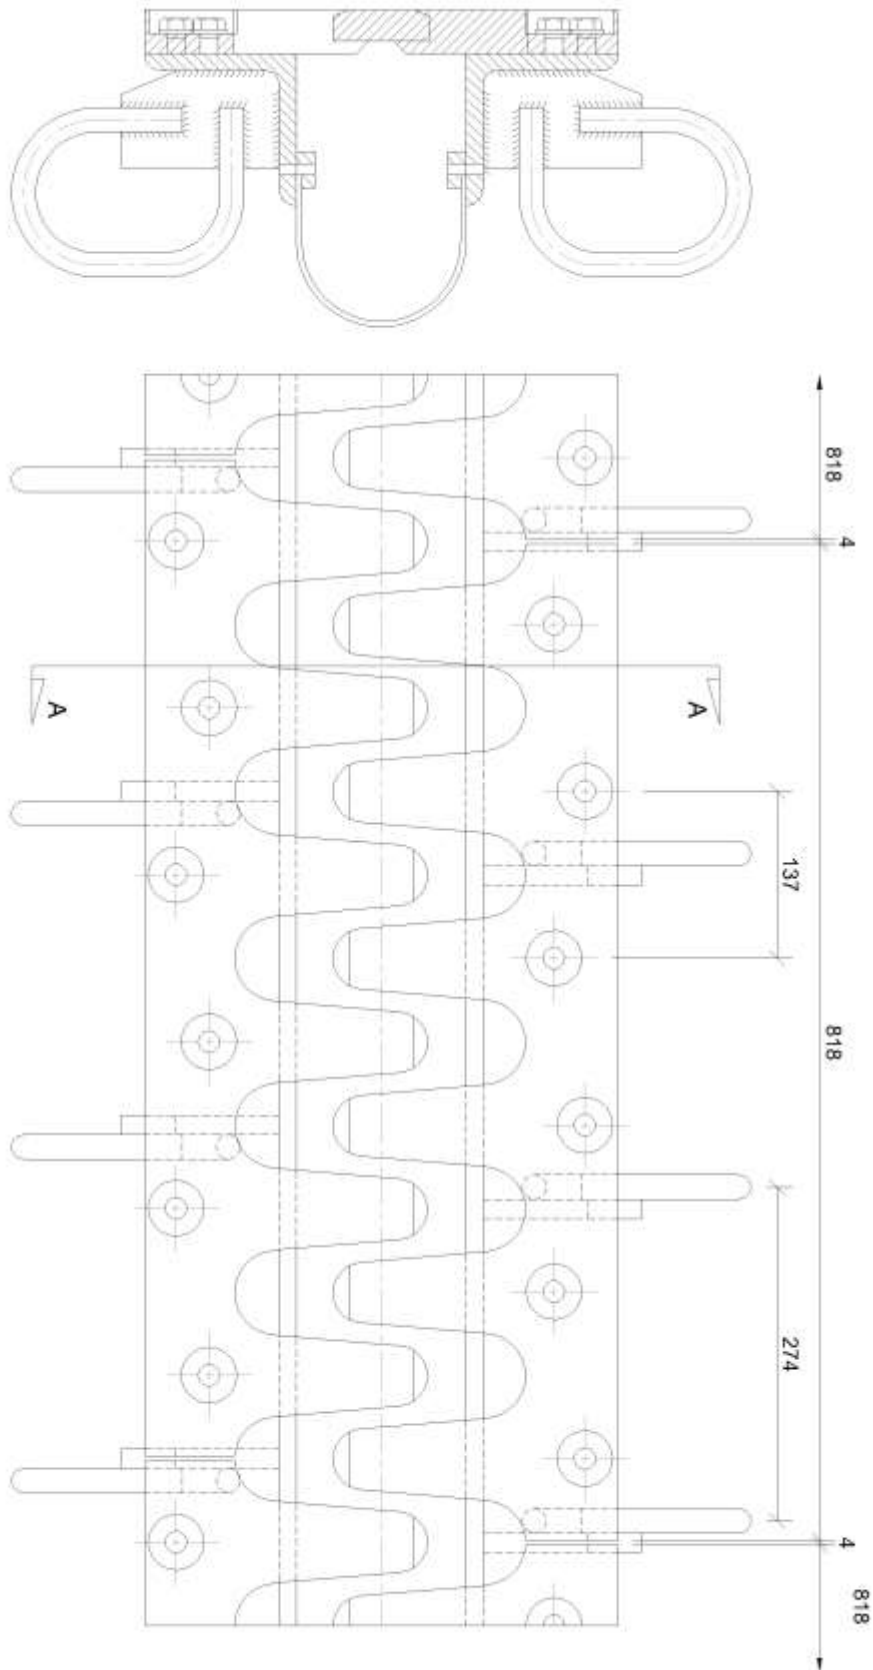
Typical dimensions and cross section for RSFD-B 160 Tensa Finger expansion joint
